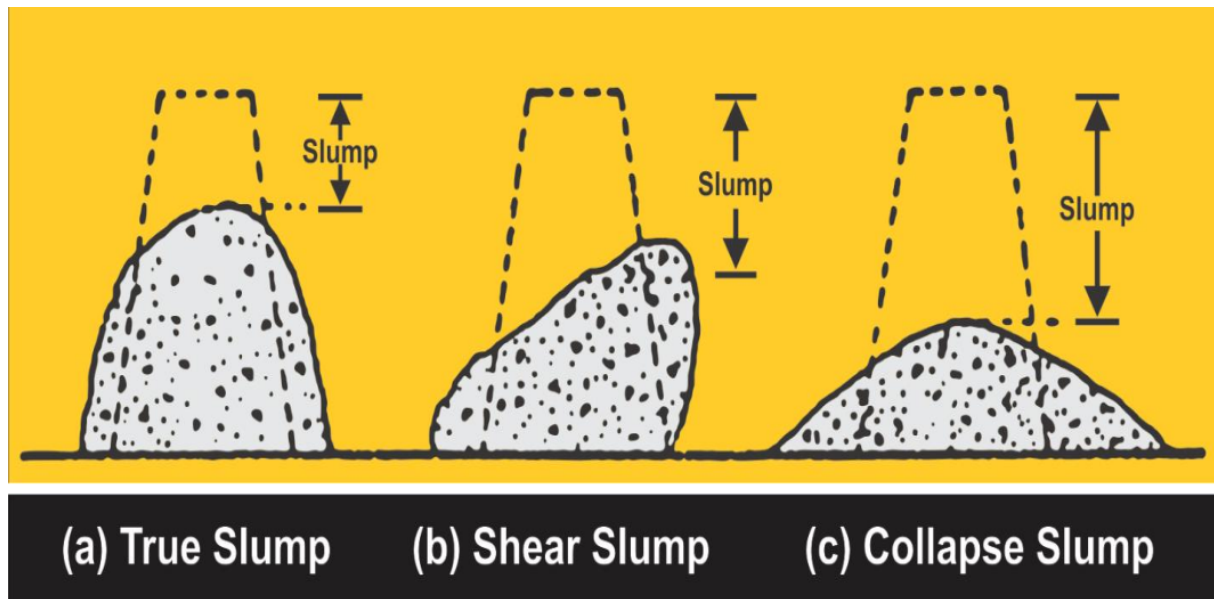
Types of Concrete Slump. Source: (Neville and Brooks (2010)).
